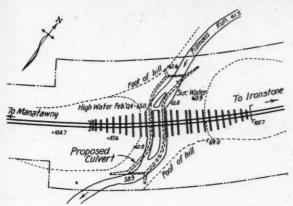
Location Plan, Reinforced Concrete Culvert.
